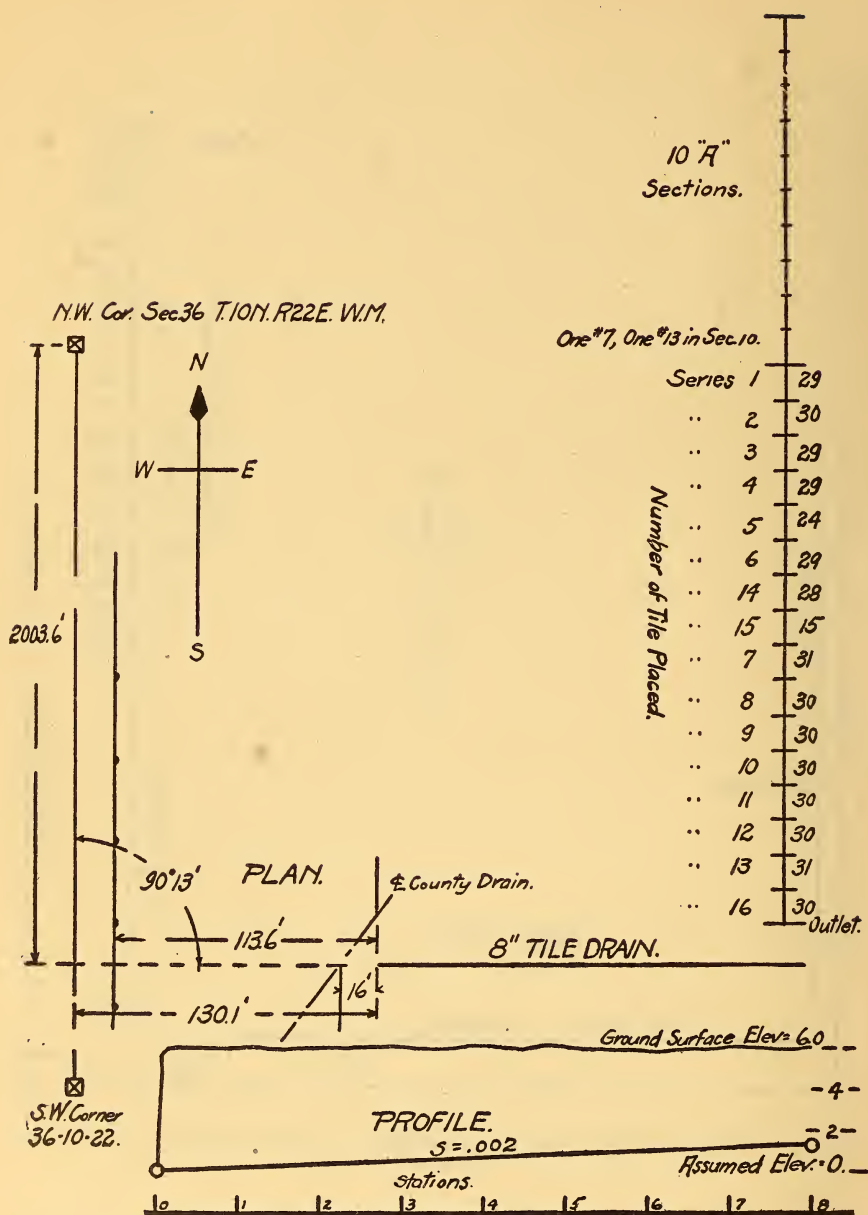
Showing location, plan, profile, and arrangement of experimental drain tile at Sunnyside, Wash.
